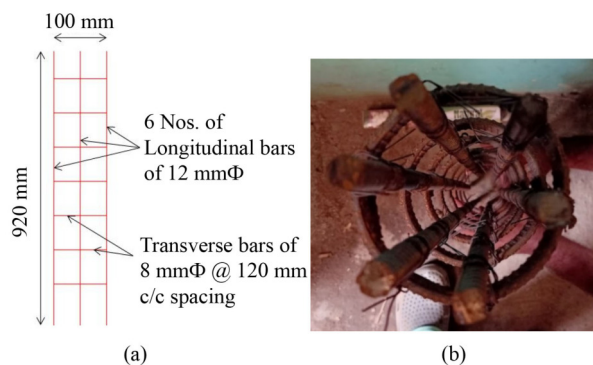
Steel reinforcement details: (a) typical sectional details of steel reinforcement; (b) *in situ* steel reinforcement.
